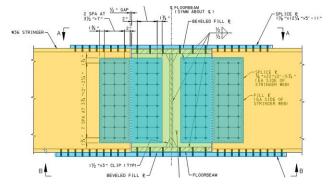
Stringer to Floor Beam Splice (Floor Beam Cross Section and Connection Plates in Green, Stringer Elevations in Orange and Splice Plates in Blue)
